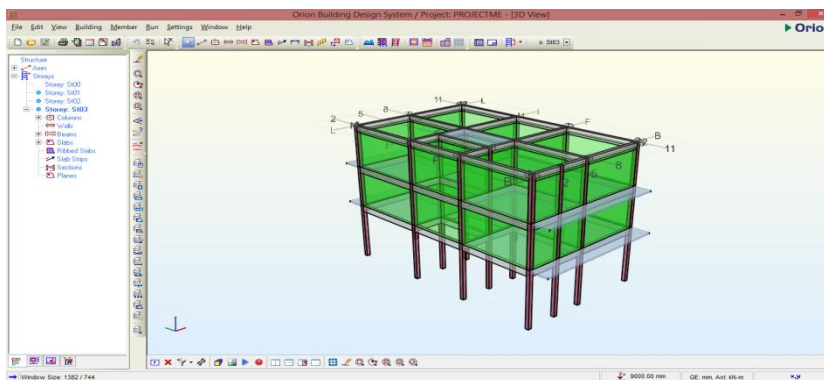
The structural arrangement shows the flow of loading from slab to beam and column
